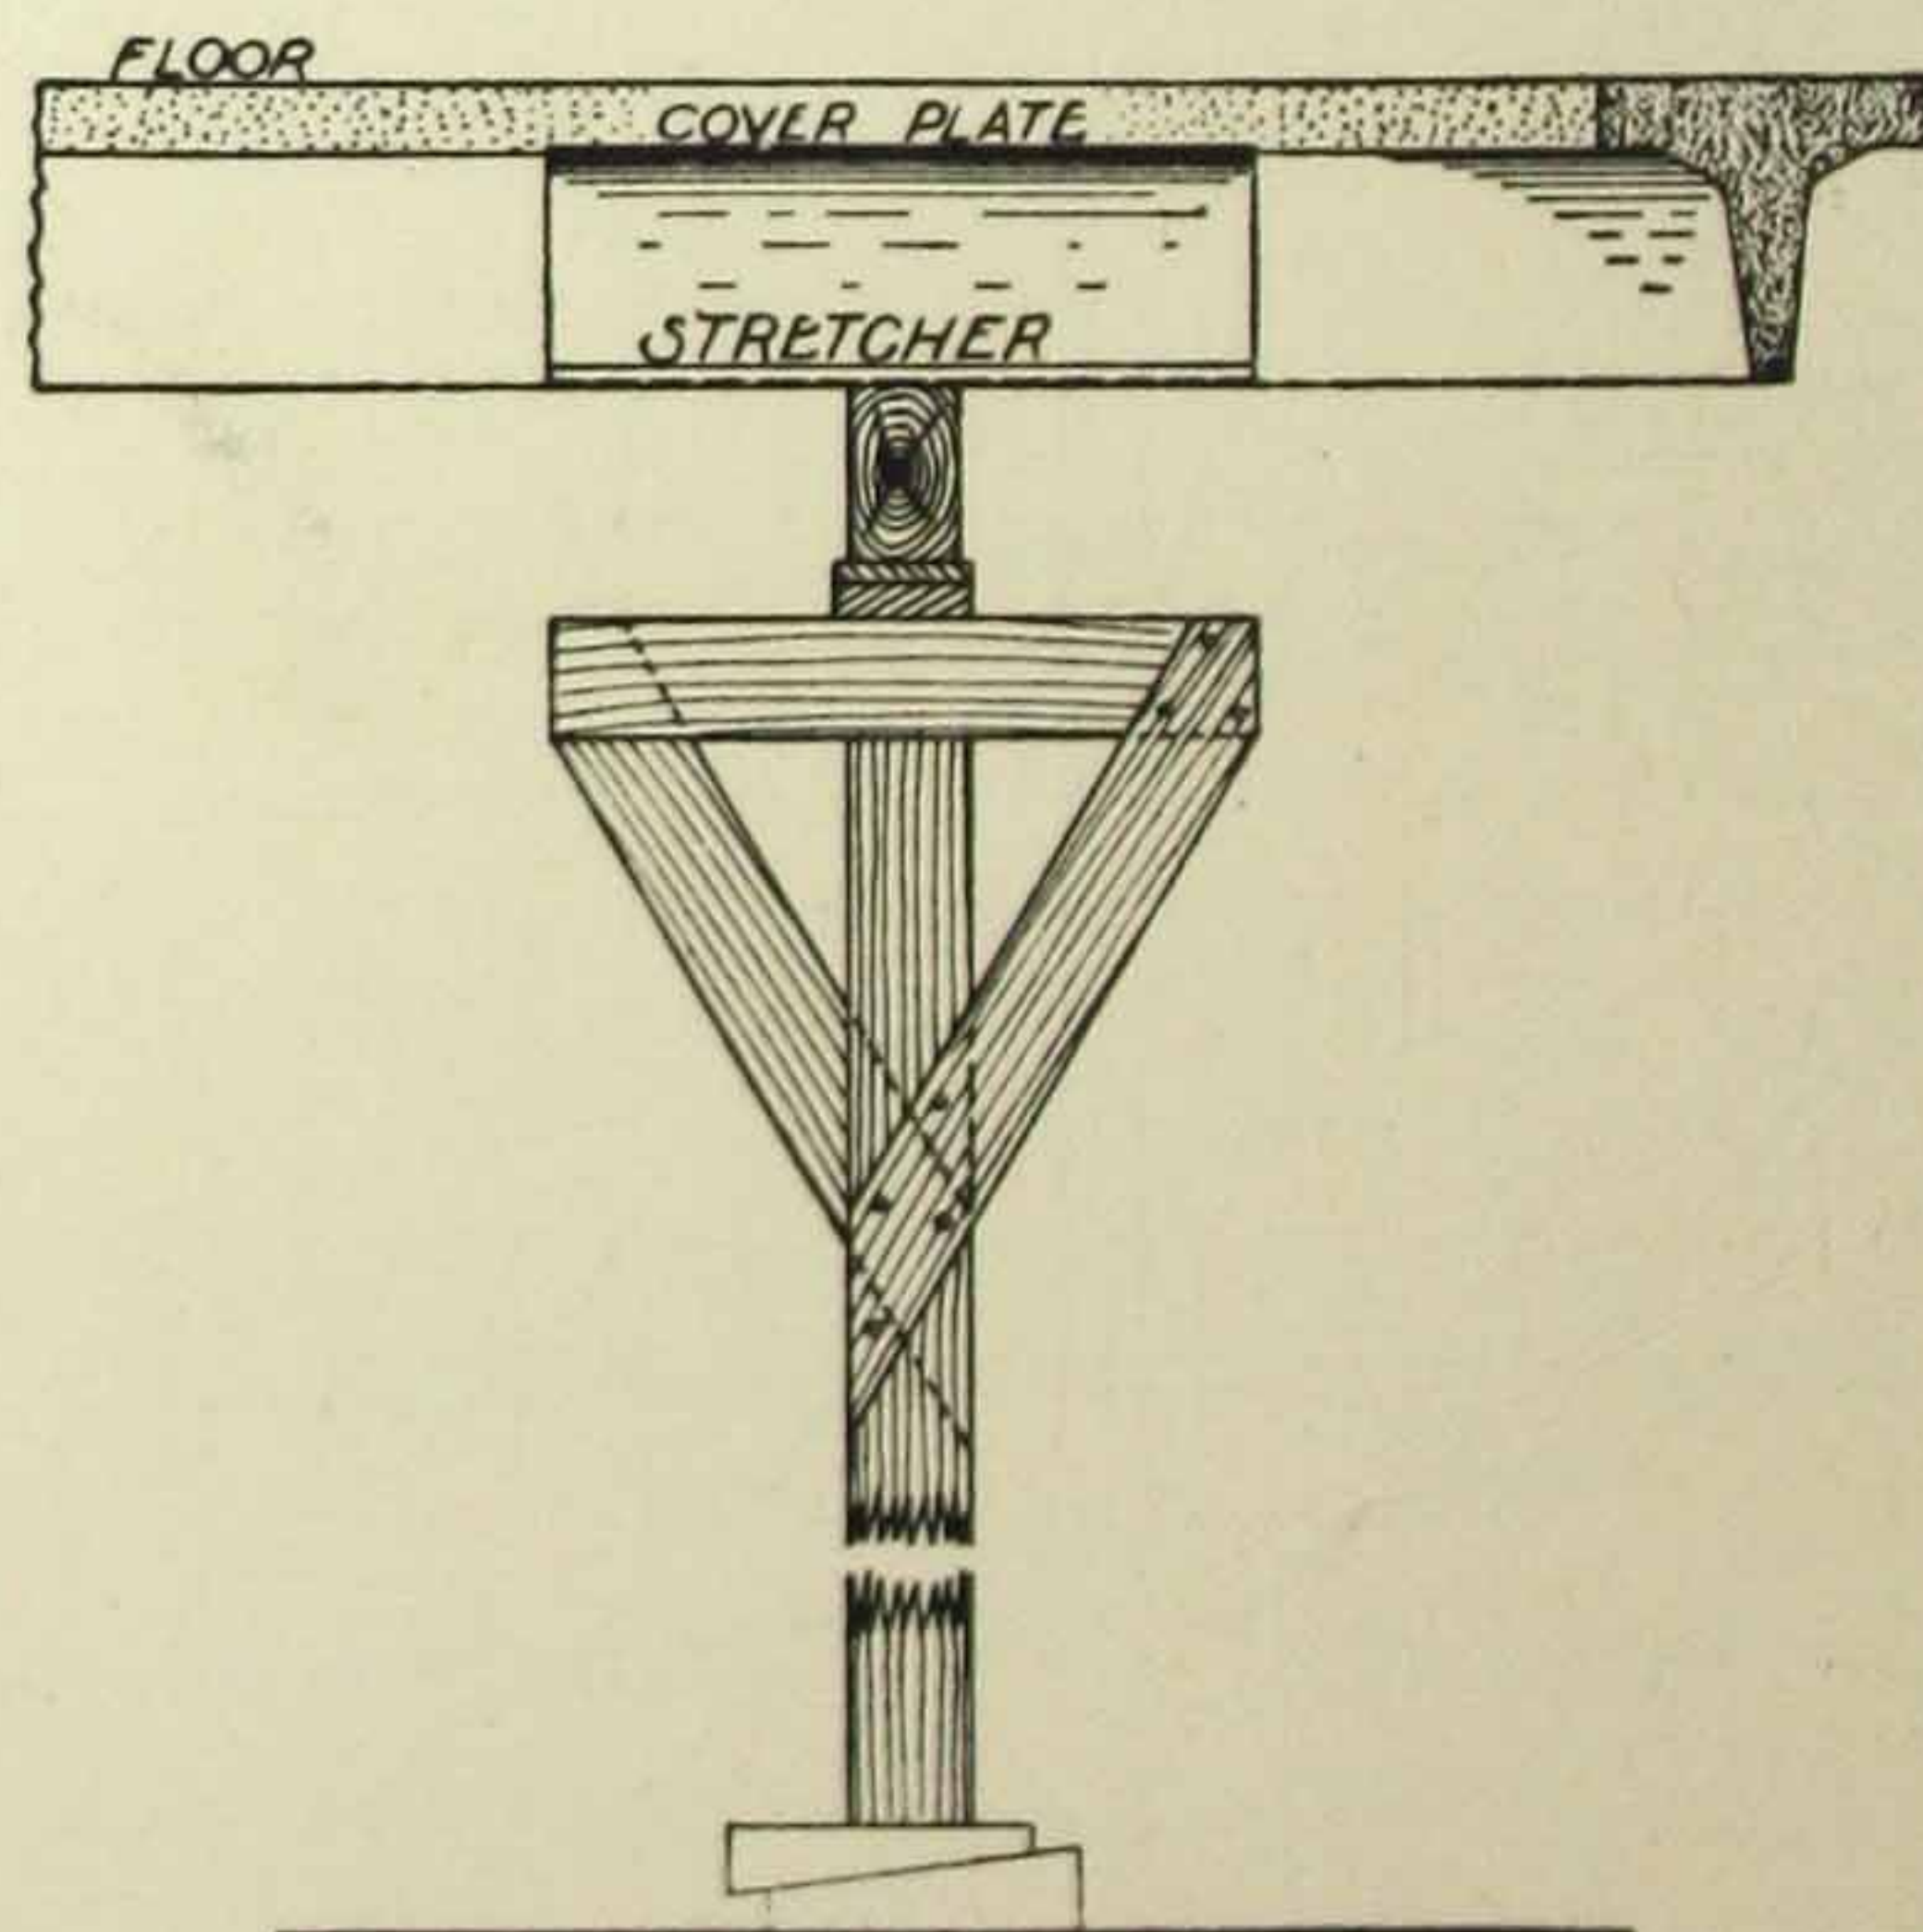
SHOWING FORMS STRIPPED BUT WITH CONCRETE SUPPORTED ON 6 TO 10 FT. SPANS FOR HARDENING
